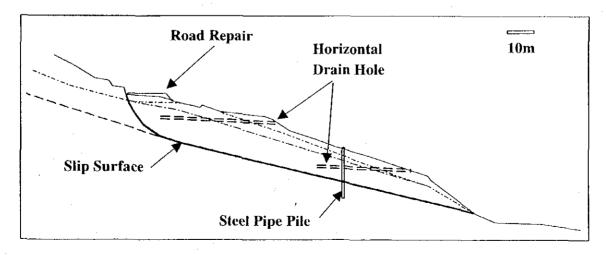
Cross Section (Steel Pipe Pile and Horizontal Drainage).
